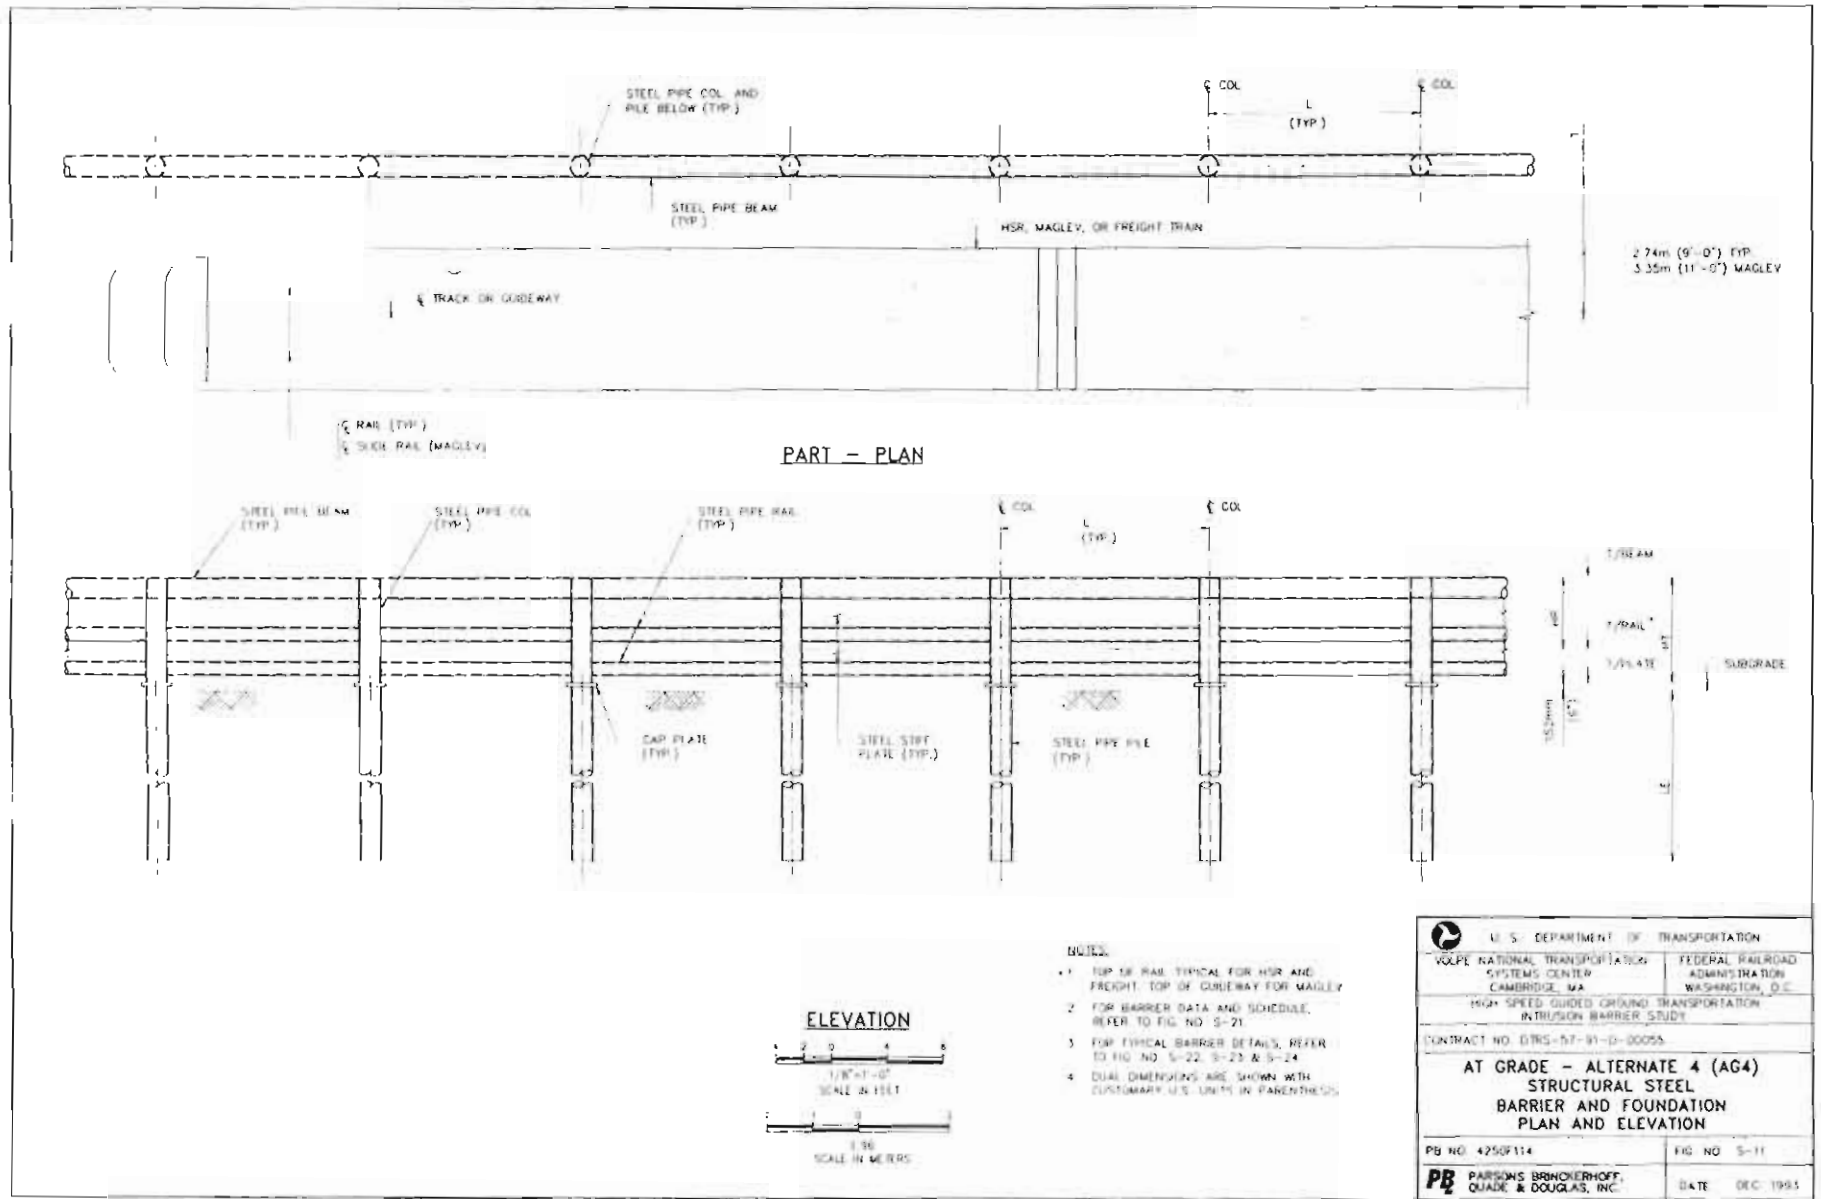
AT GRADE ALTERNATE 4: STRUCTURAL STEEL POST, RAILING AND FOUNDATION - PLAN AND ELEVATION
